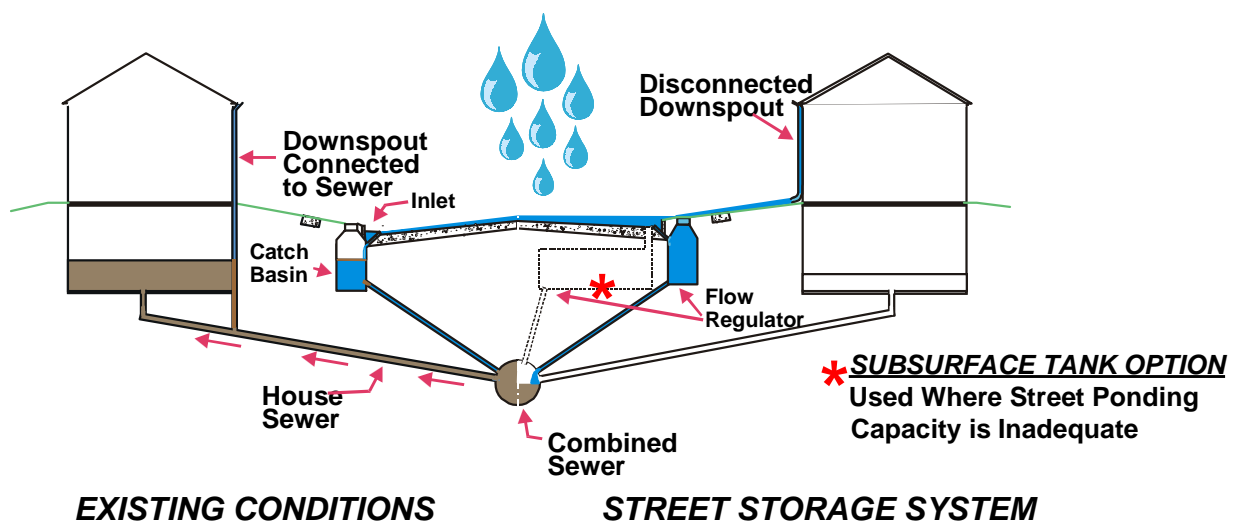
Downspouts connected to the house sewer, as shown on the left side, permit roof water to directly and immediately enter the combined sewer system and increase surcharging.
